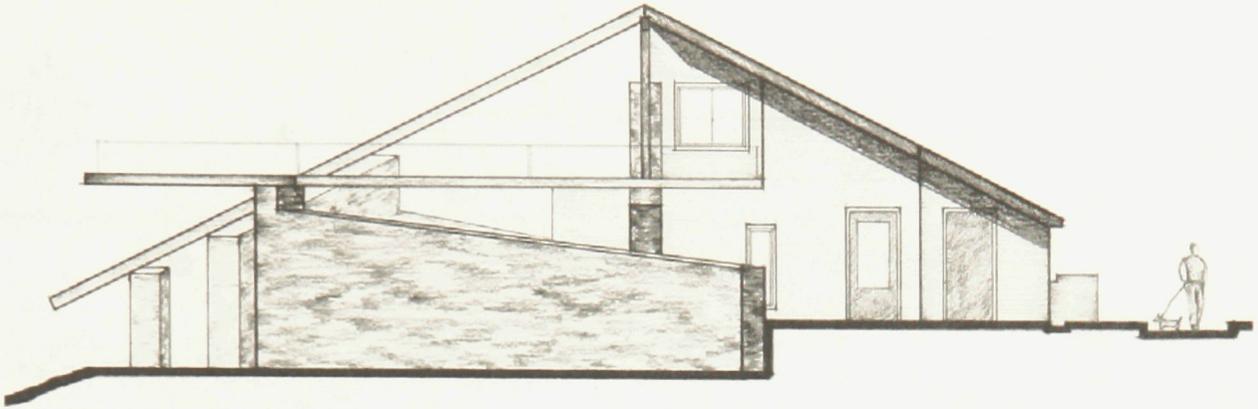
Pavilion: East Elevation*, graphite original 8" x 14" @ 1:100, 2008. Created by author.
